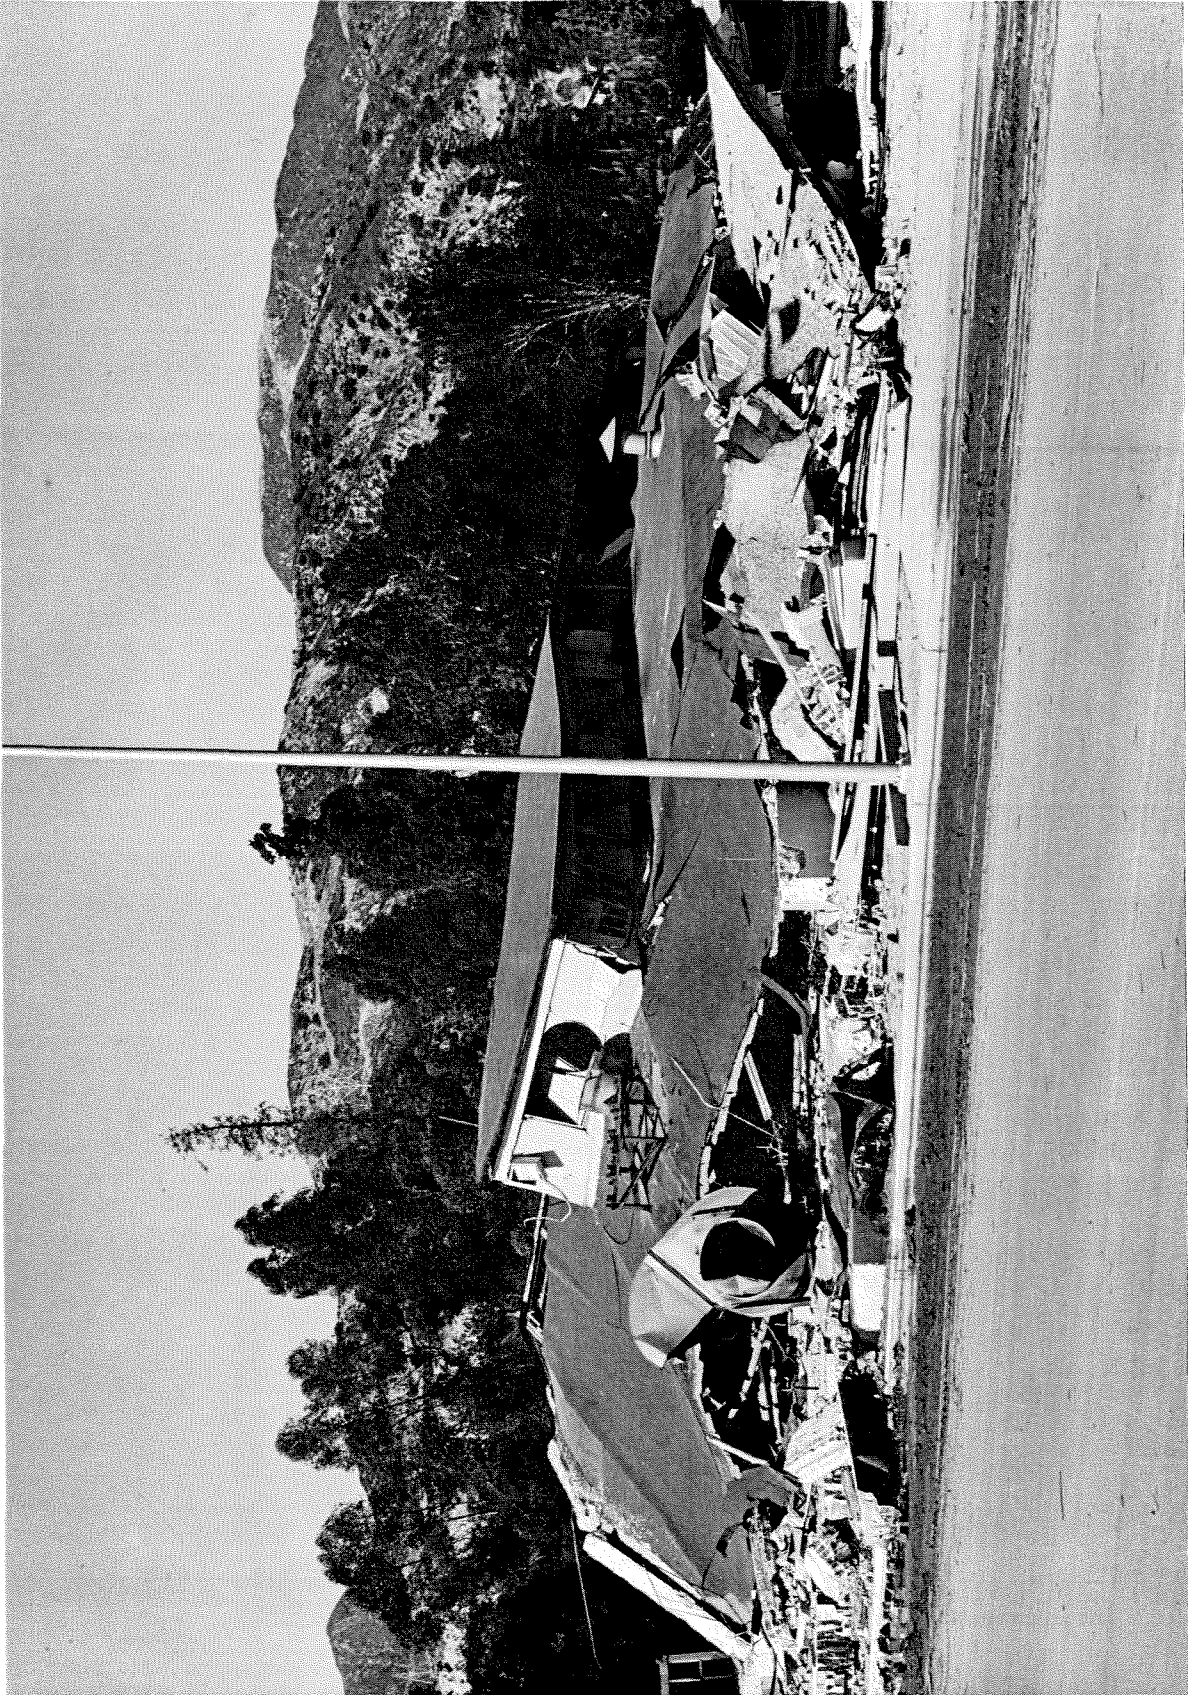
168 Complete collapse of old brick wall building that was not designed to resist earthquakes. A service building at Olive View Hospital. Ralph Samuels photo.
